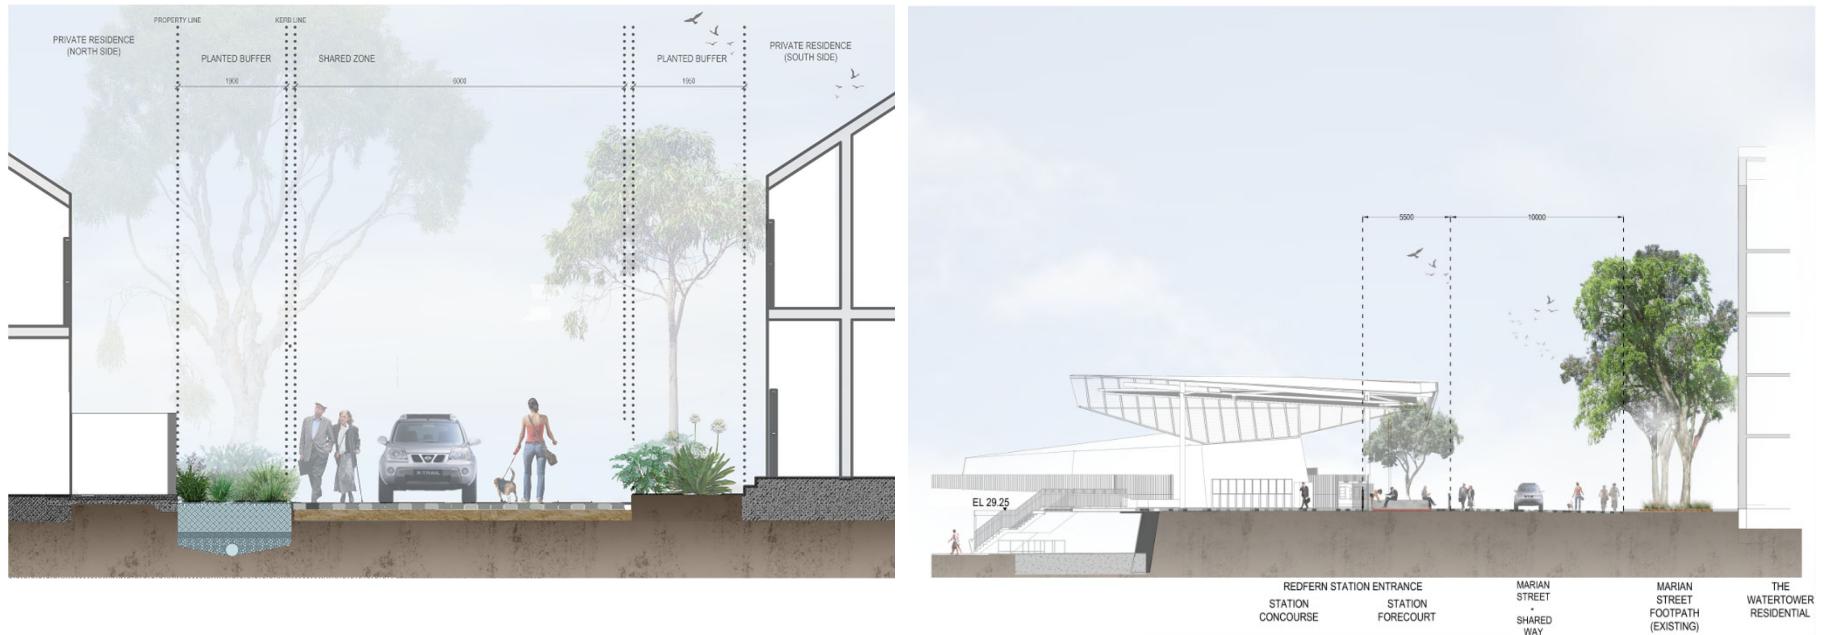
Indicative cross section – Little Eveleigh Street and Marian Street shared zones
